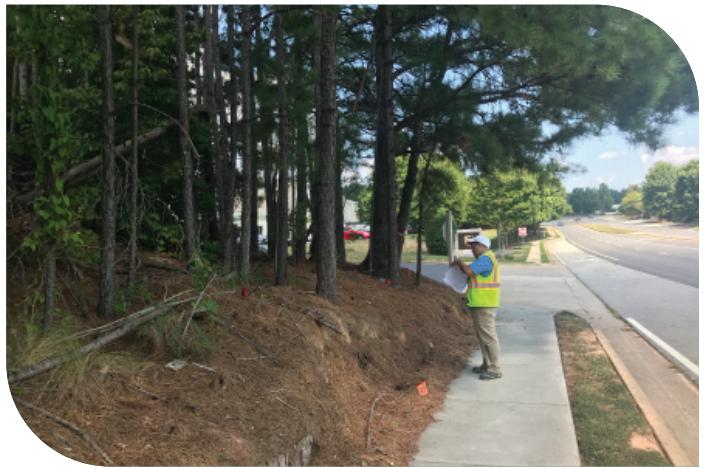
Wildwood Road, adjacent to Peachtree Ridge Park. A crossing is necessary in this location, to connect into the park.
